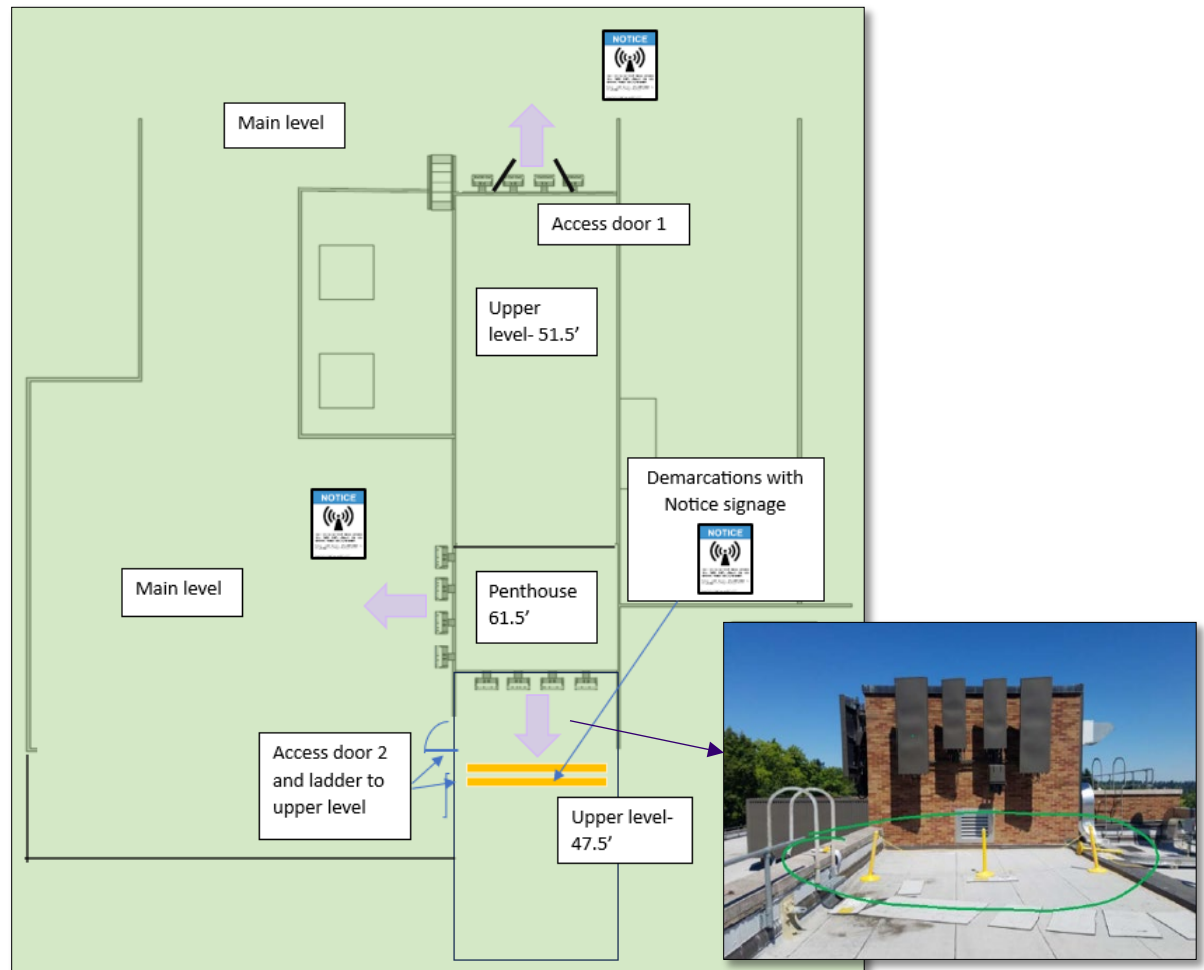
View looking down at the roof of Mechanical Engineering Building.
